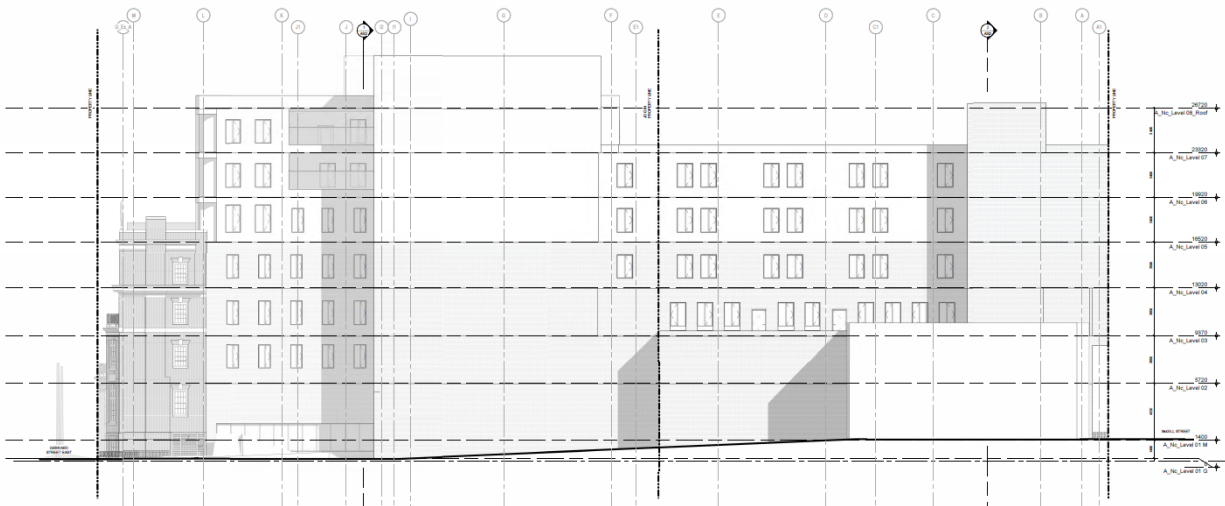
West elevation drawing included for illustration purposes (ERA Architects Inc., March 3, 2026).
